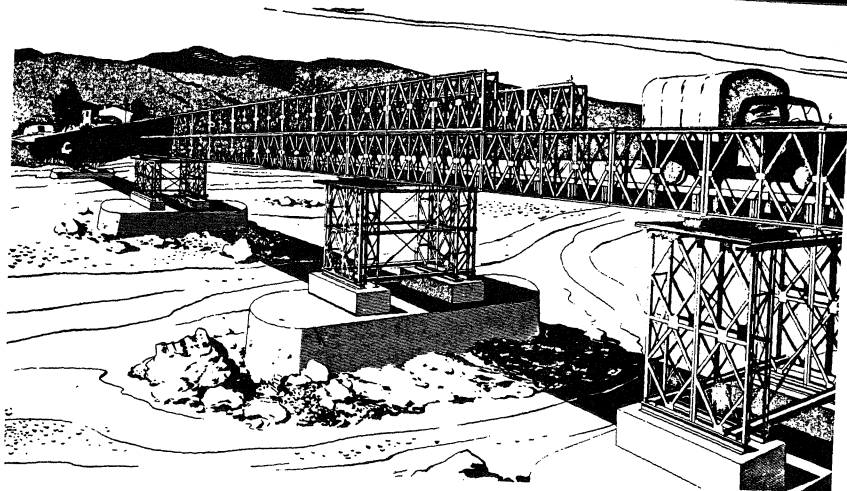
Two continuous panel bridges with panel crib piers on pile piers.
